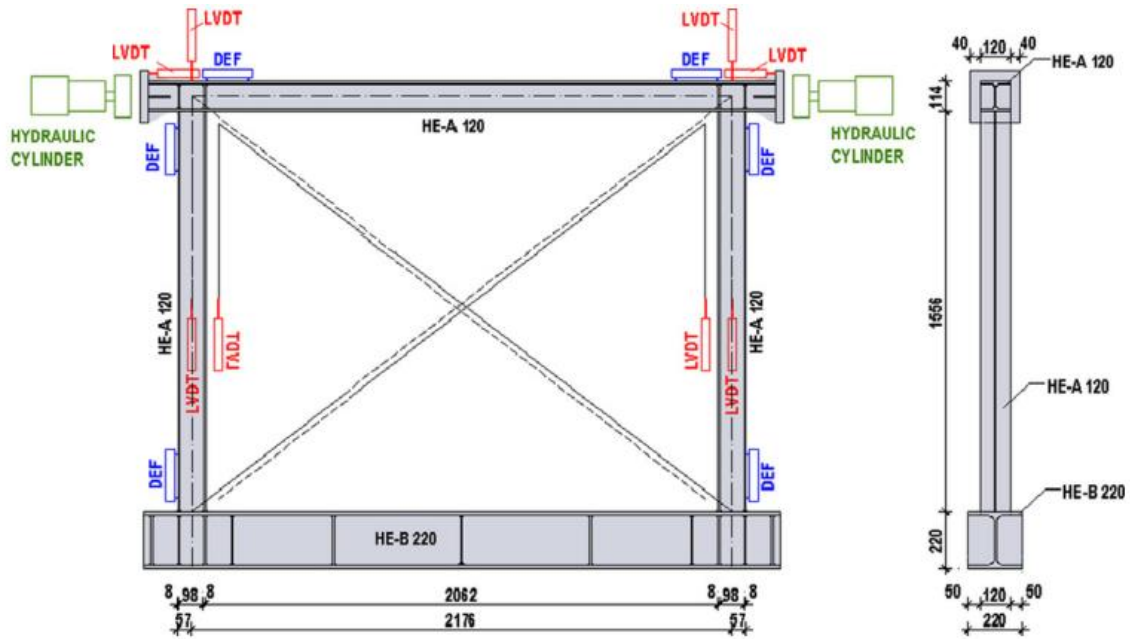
Dimension of the steel frames and measuring instrumentation [18]
